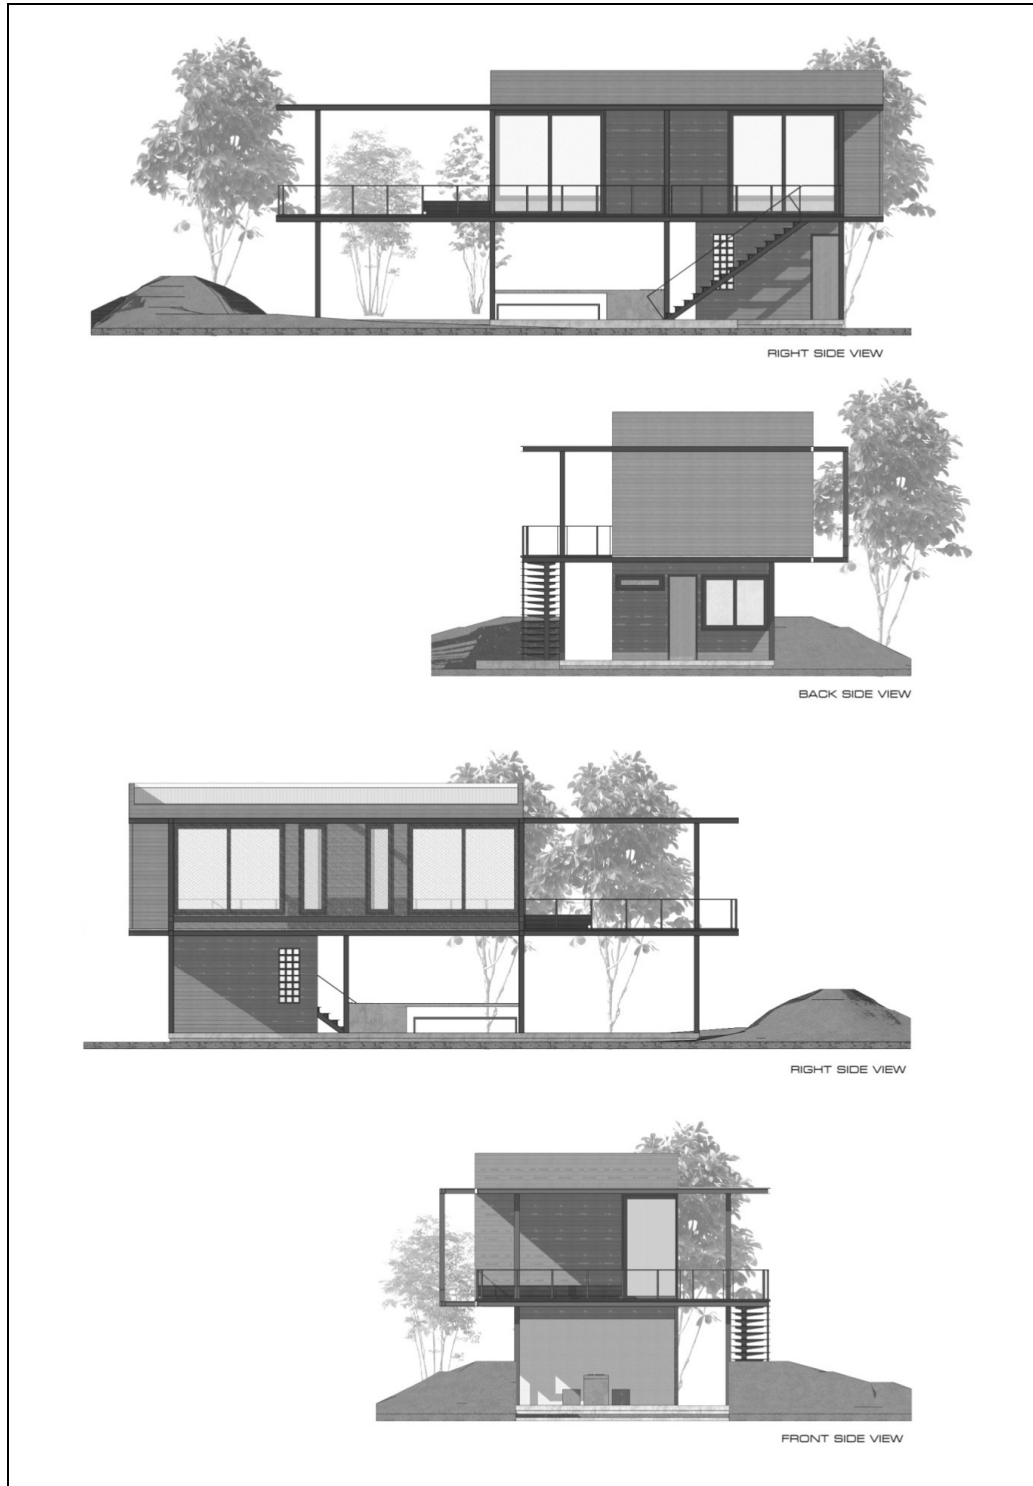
Elevation 1-4: the elevation shown the harmony between the house and its context.
